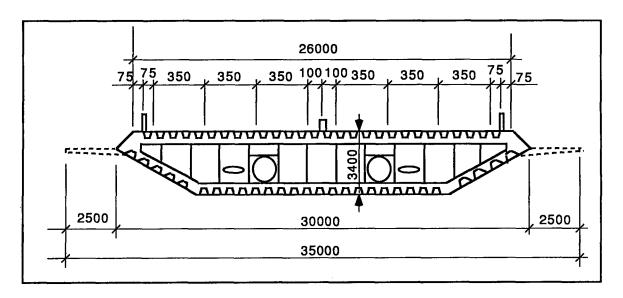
CROSS SECTION, MAIN SPAN (In mm)
